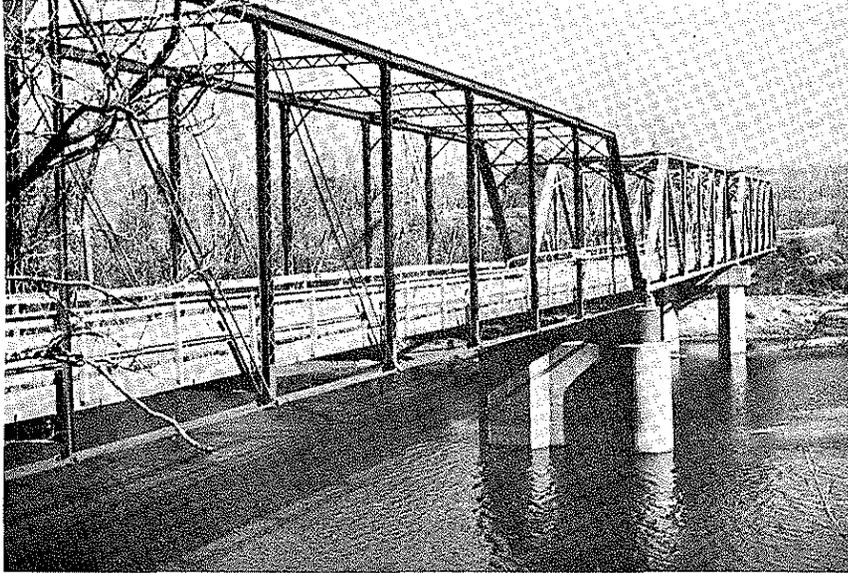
Photograph of Hanley Bridge (Polk County).
